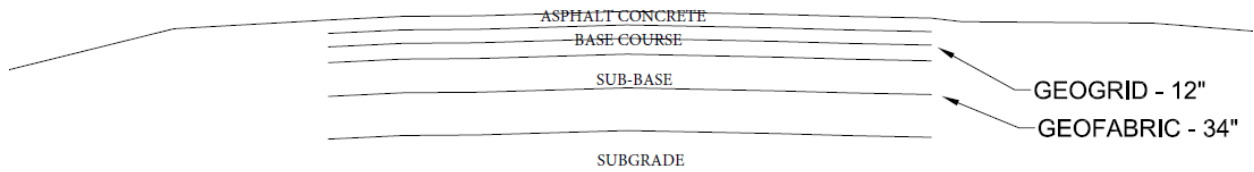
The as-built cross section of the test section FWD5-2. Horizontal scale is equal to vertical scale.
